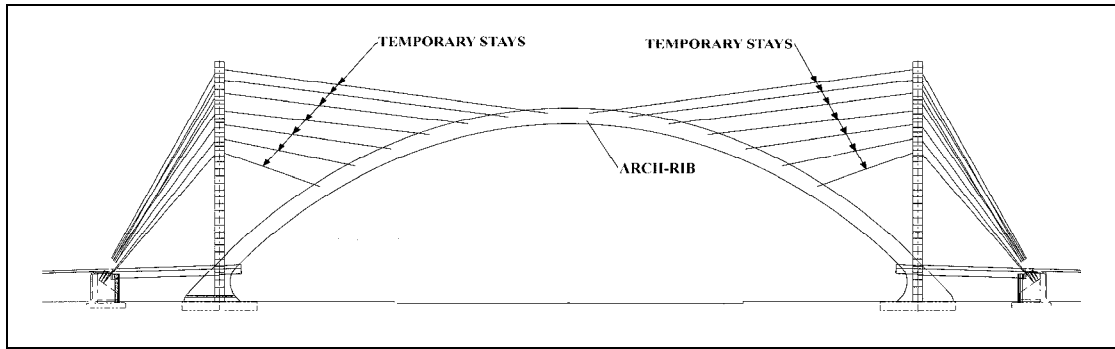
Step 3-Complete Arch (Modified IRIB Specifications and Construction Plans)
